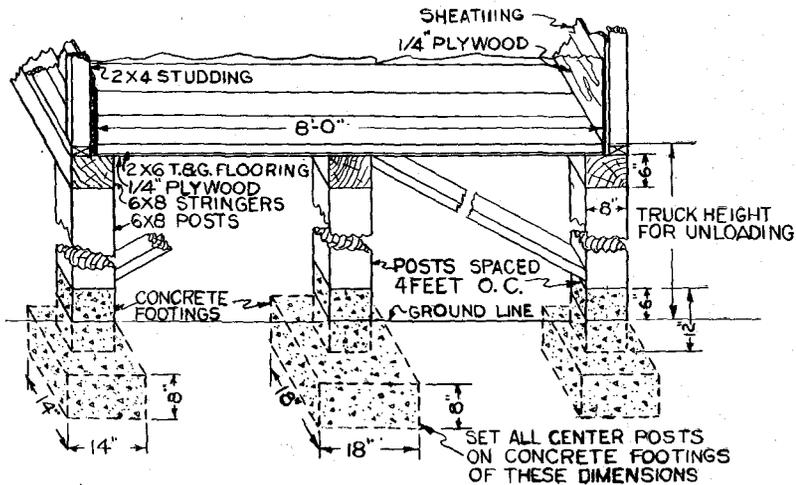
Foundation detail. The bottom of the footings should be about 14 inches below ground level.
